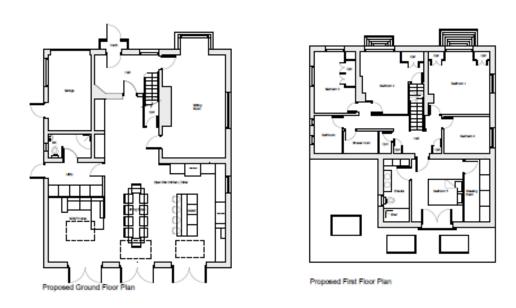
Approved ground and first floor plans No.77 Park Avenue East
